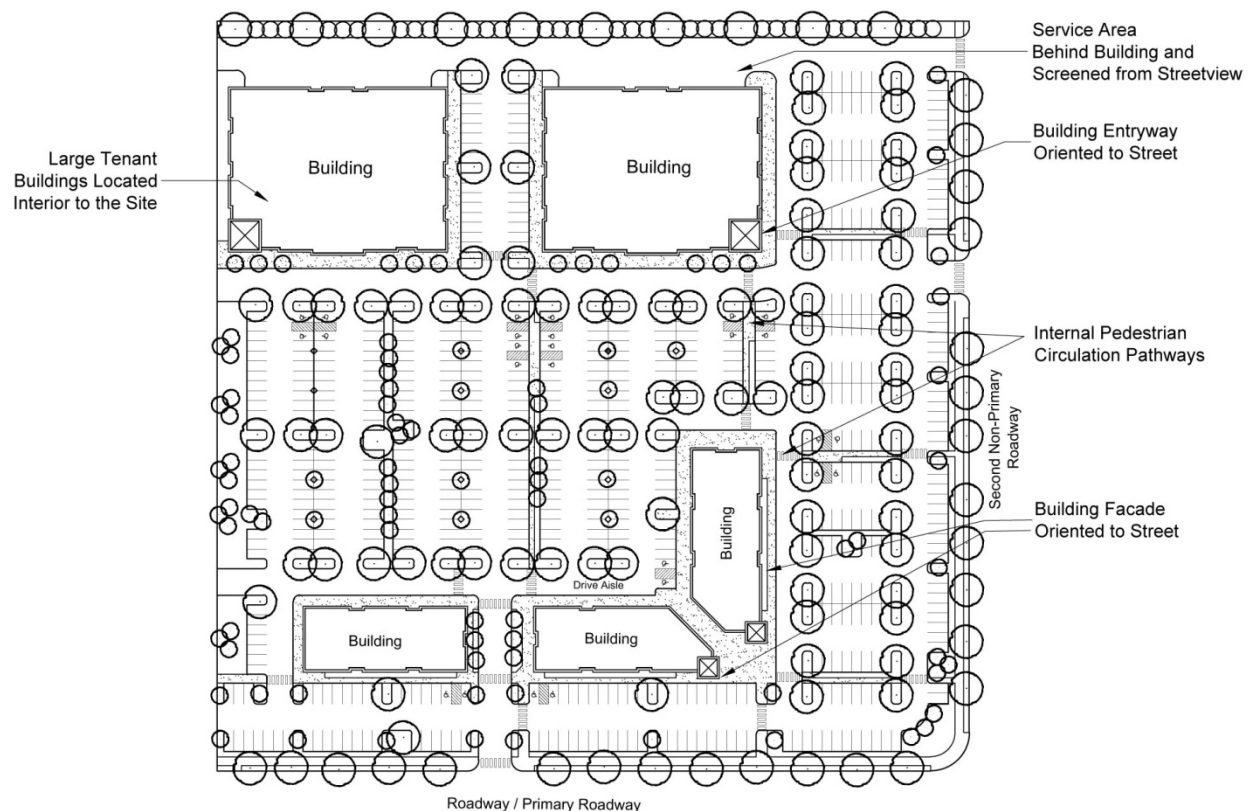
(b). – Site Layout - Building Orientation Standards
